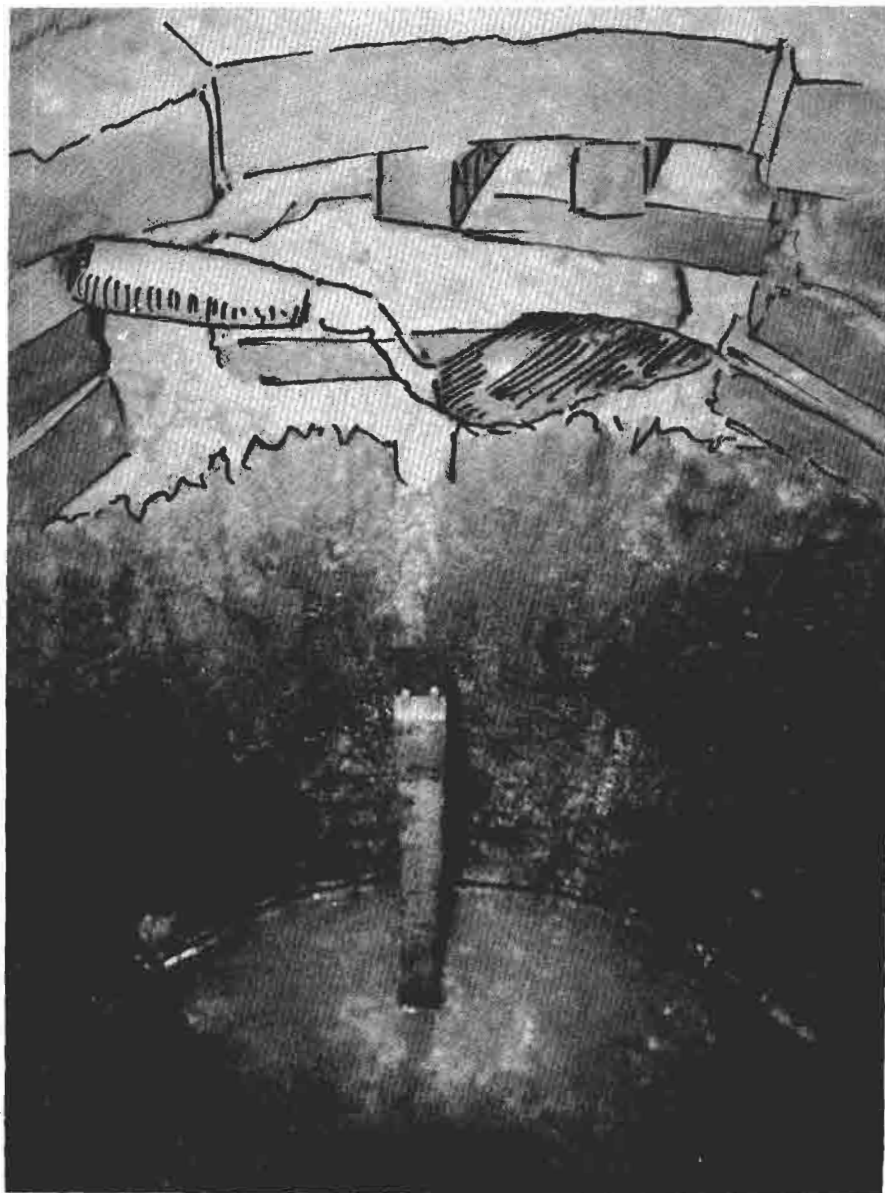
Photograph of the well interior (retouched) at the juncture of the wood walls and brick shaft. Shims and minor shoring were introduced behind the trowel and the point where the decay of wood failed to support well bricks.
